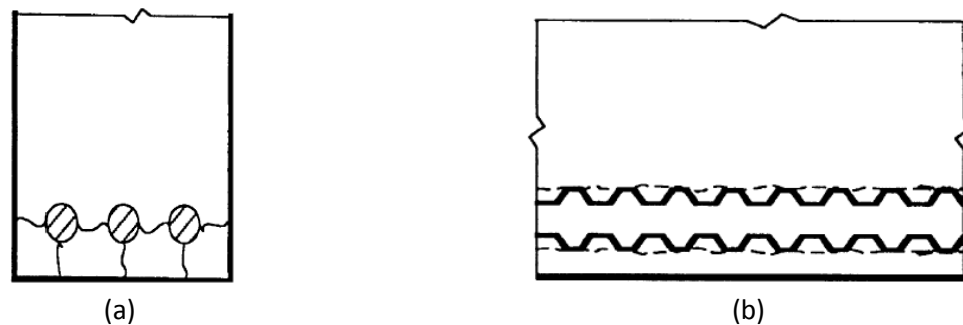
Cracking and damage mechanisms in bond: (a) End view showing splitting cracks between bars and concrete cover; (b) Side view of member showing shear crack and/or local concrete crushing due to bar pullout. (Source: ACI 408R-03)
